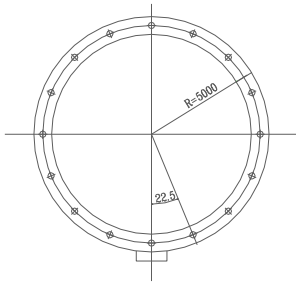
cylinder wall prestressing tendons ring plane indicate the calculated point
